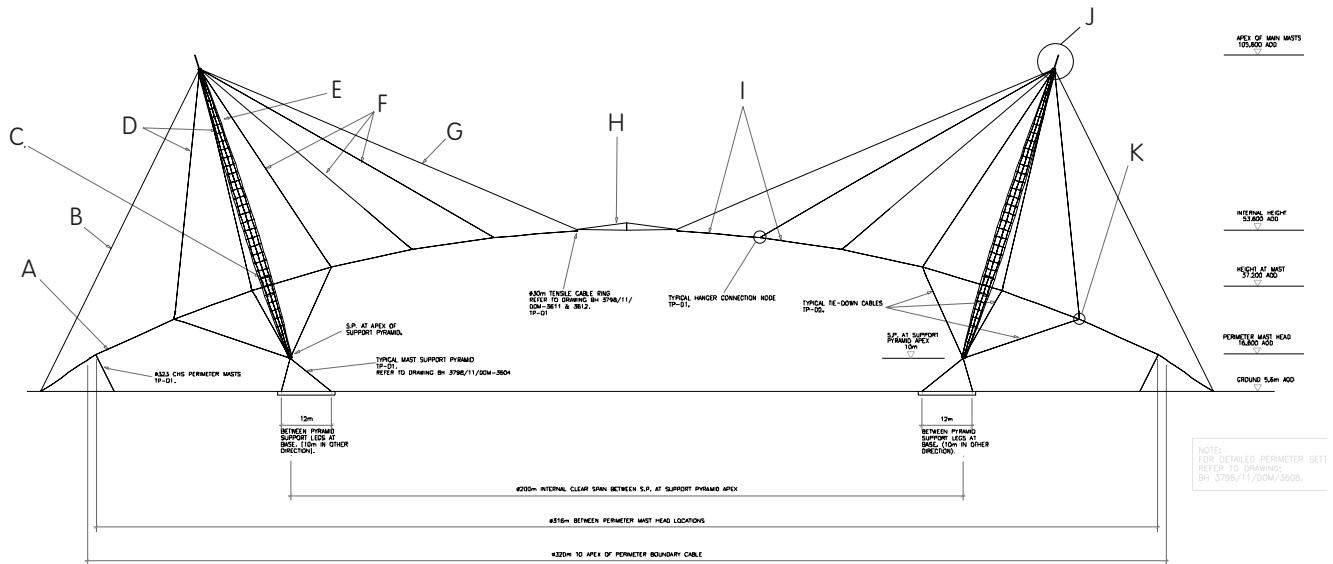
UK Millennium Experience Dome, section. A, Radial stringer cables continue to ground at 12 No locations around perimeter; B, Typical backstay cable, TP-02; C, Extract fans mounted on mast axis at roof level shown dashed, TP-04; D, Typical hanger cables, TP-02; E, Main steelwork support masts, TP-01; F, Typical hanger cables, TP-02; G, Typical forestay cable, TP-02; H, Central 630-m cable truss independent cladding system; I, Typical radial stringer cables in discrete lengths between hanger connection nodes, TP-02; J, Mast head detail, TP-01; K, Typical hanger tie-down connection node, TP-01.
